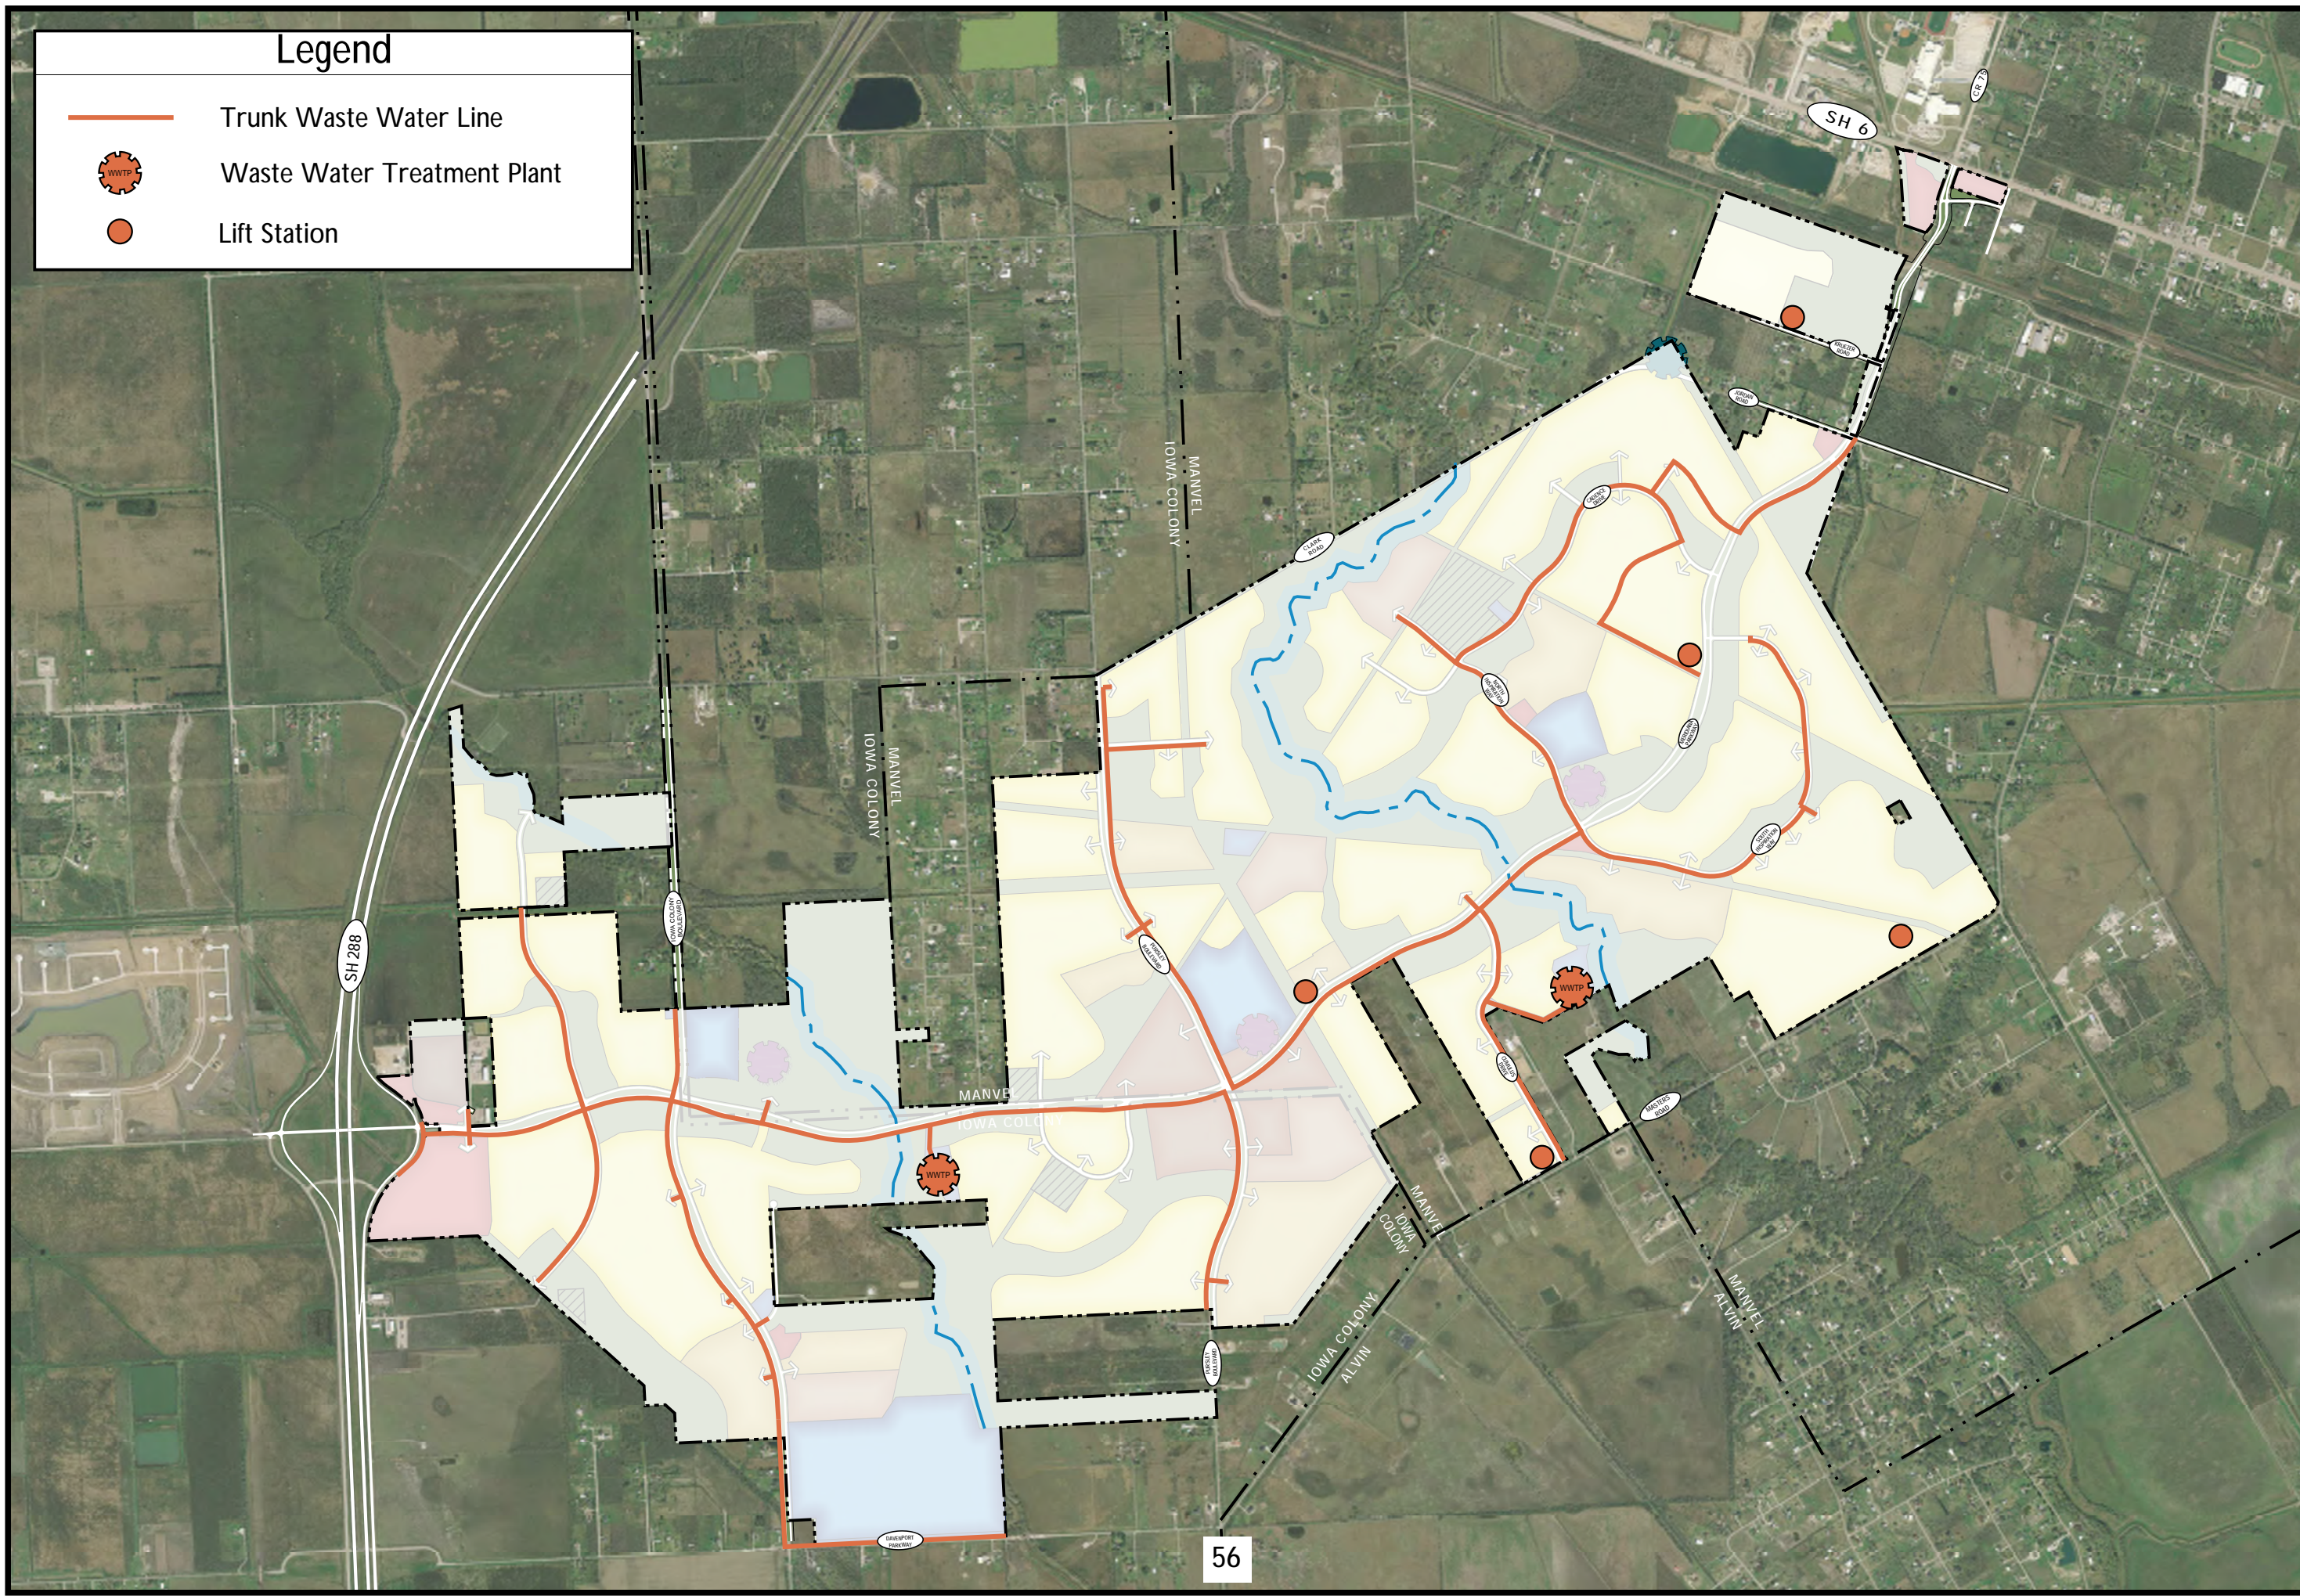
Sanitary Sewer Collection & Treatment Plan
